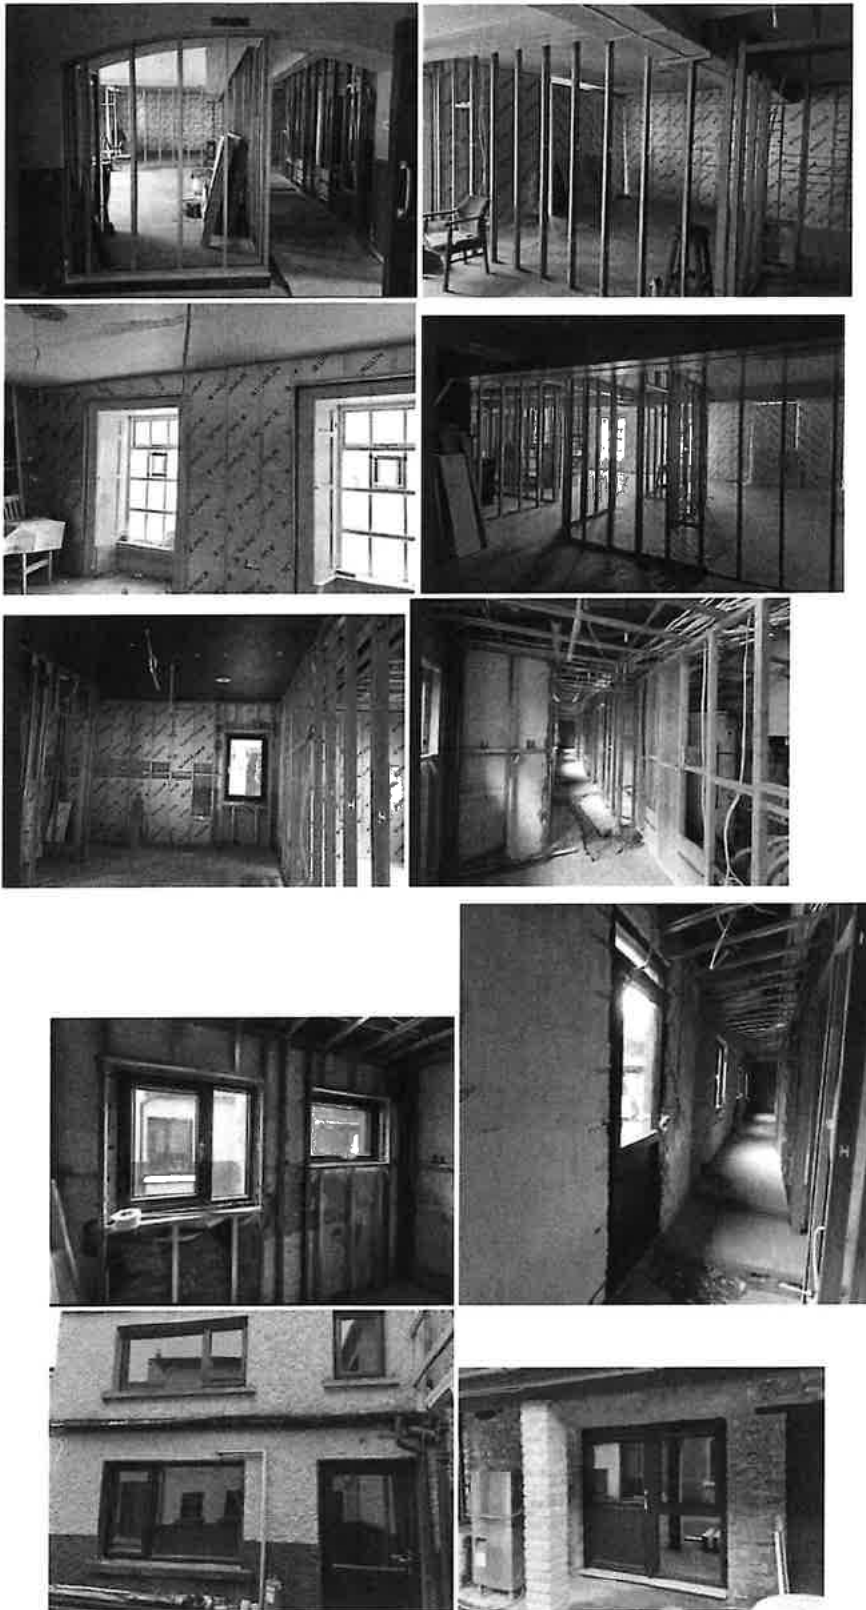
Extract from Planner report associated with Reg Ref 24/60072 illustrating works already undertaken for which retention was sought.
